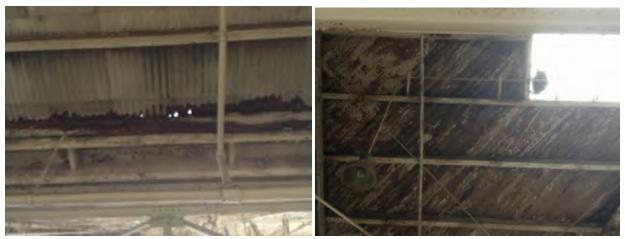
Building 108 metal roof from interior on left and wood roof from interior on right
